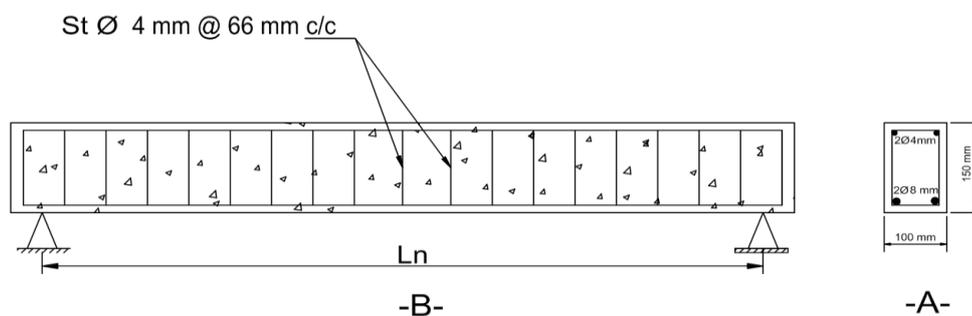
Details of specimens all dimensions in mm: (A) cross-section; (B) Elevation.
